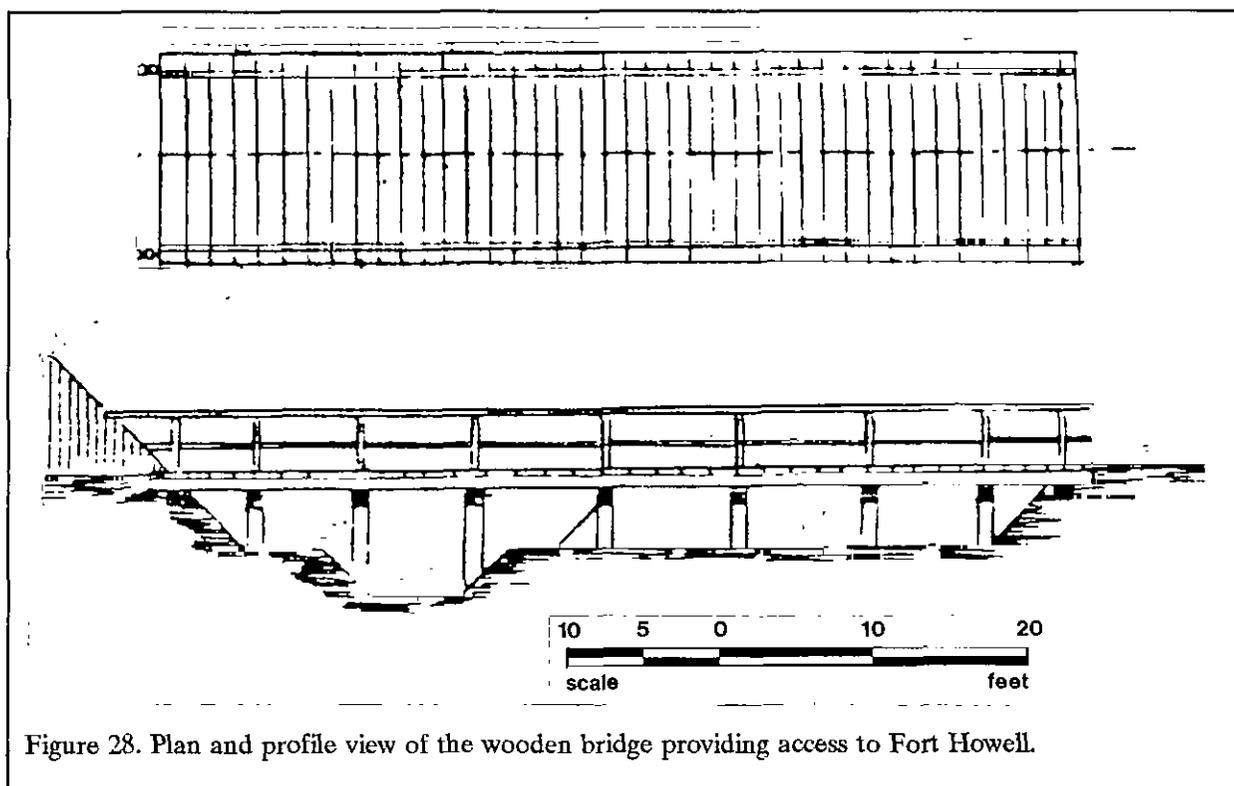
Plan and profile view of the wooden bridge providing access to Fort Howell.
